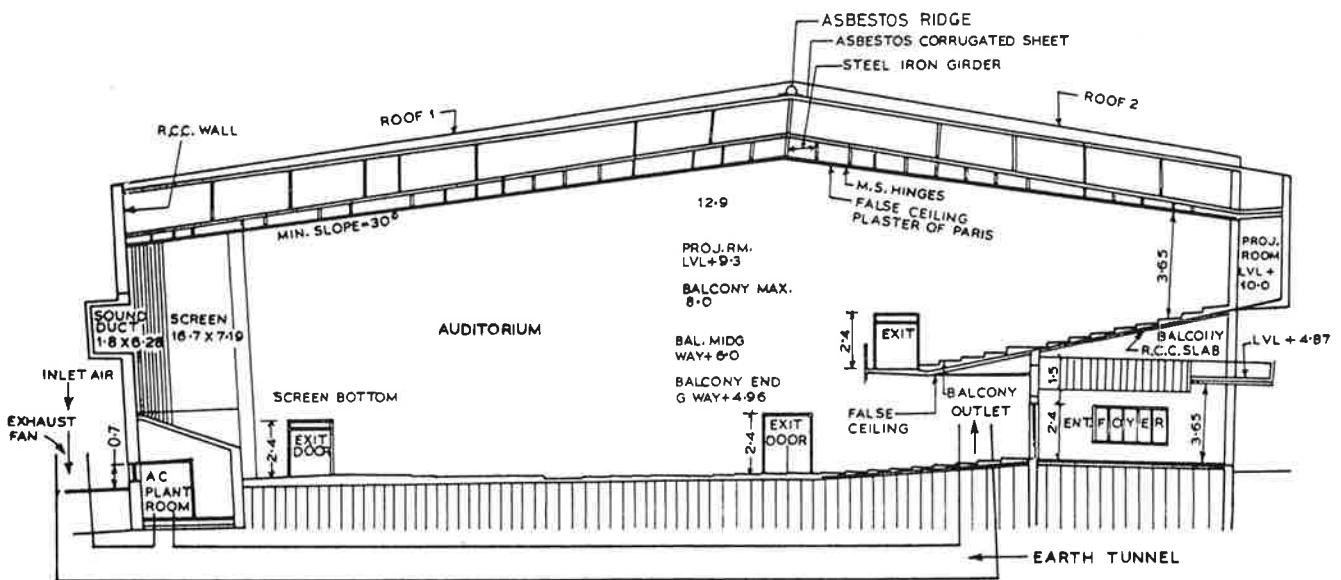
Cross-sectional view of the proposed cinema hall with earth air tunnel (all dimensions are in metres).
